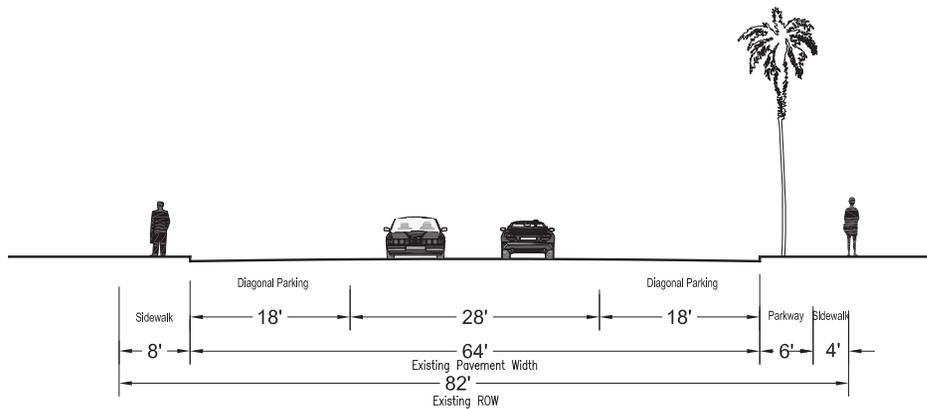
TYPICAL SECTION - RESIDENTIAL
